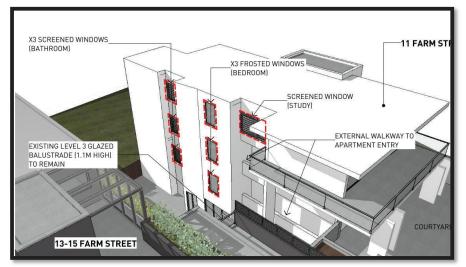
Western elevation of 11 Farm Street, facing the subject site.
